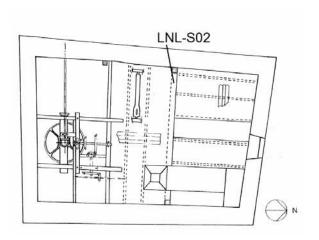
First-floor plan of Linnels Mill showing the location of sample LNL-S02 (Adult Education Class, University of Newcastle upon Tyne)
